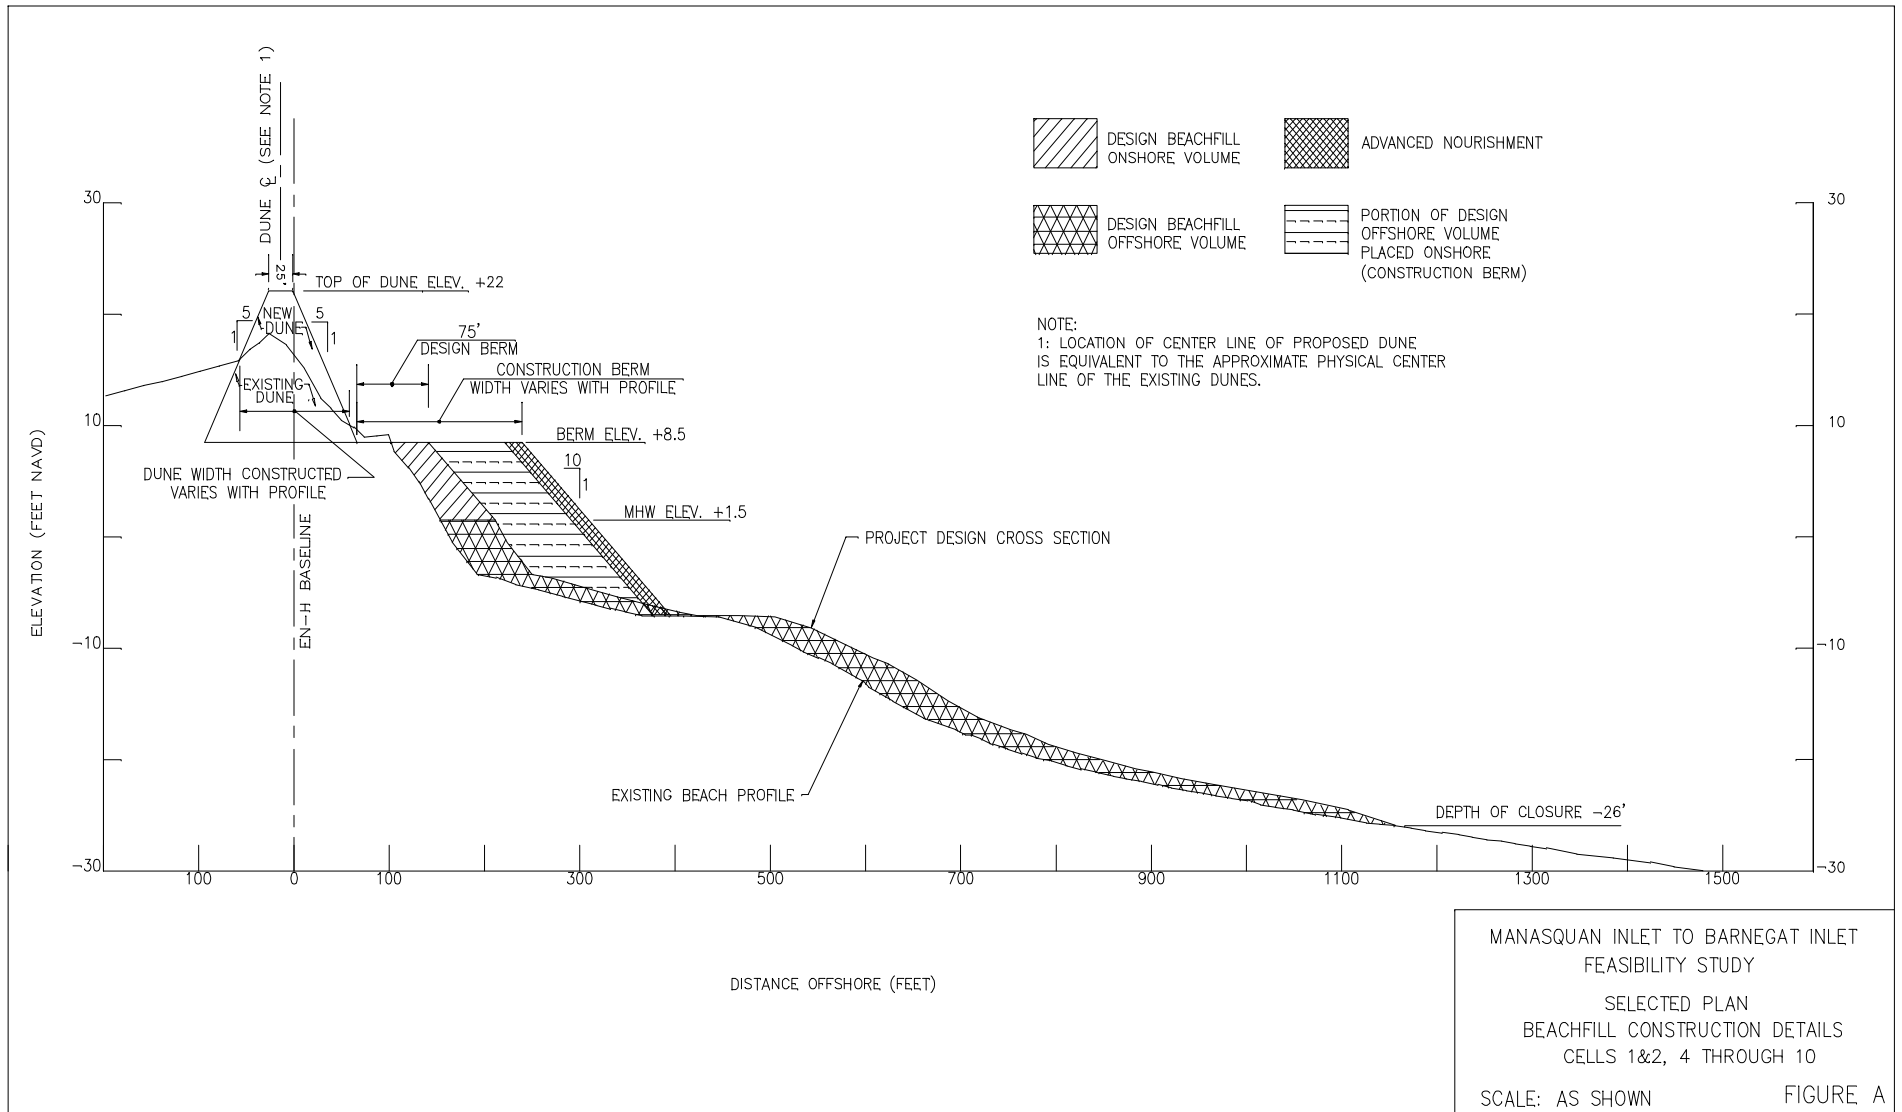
Selected Plan - Typical Design Cross-Section with 22-ft NAVD Dune (All Communities except Seaside Heights and northern Point Pleasant Beach)
